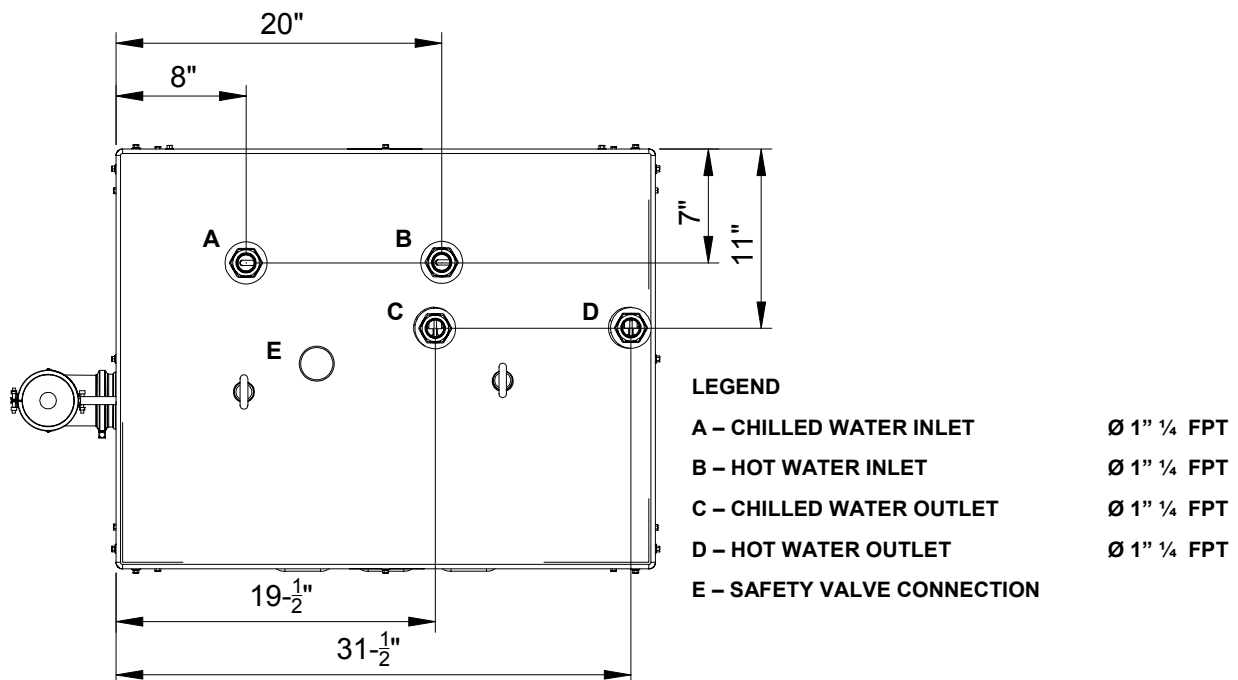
GAHP-W and GAHP-W LB connection dimensions.
